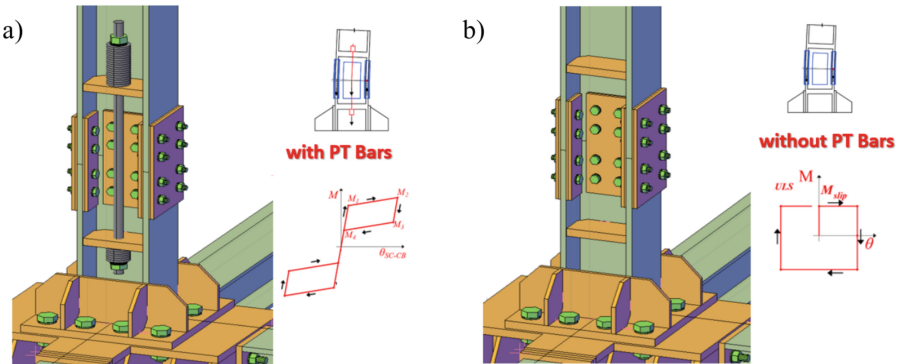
3D view and moment rotation behaviour of: a) SC-CB; b) LD-CB.
